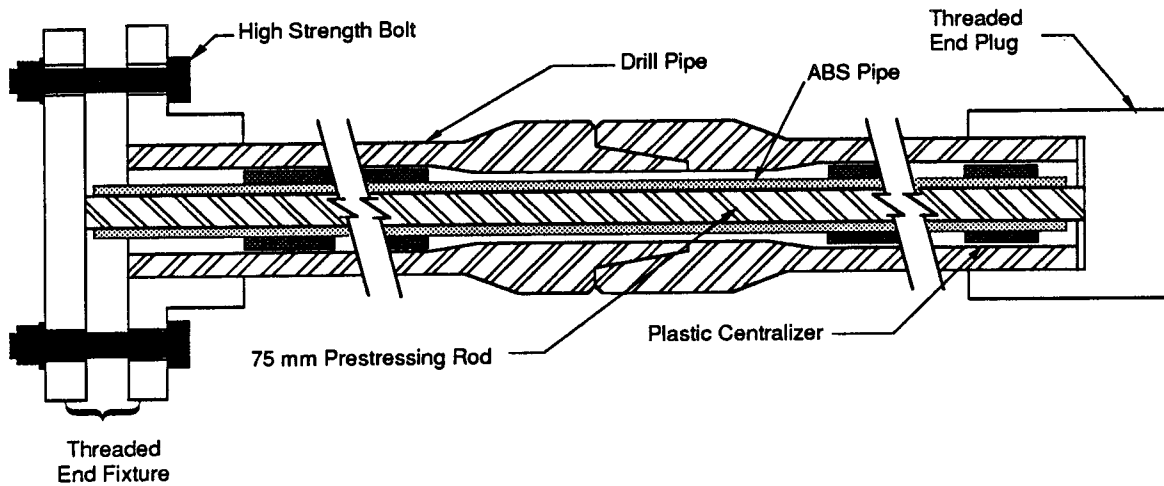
Section Through Drill Pipe With Prestressing Arrangement
